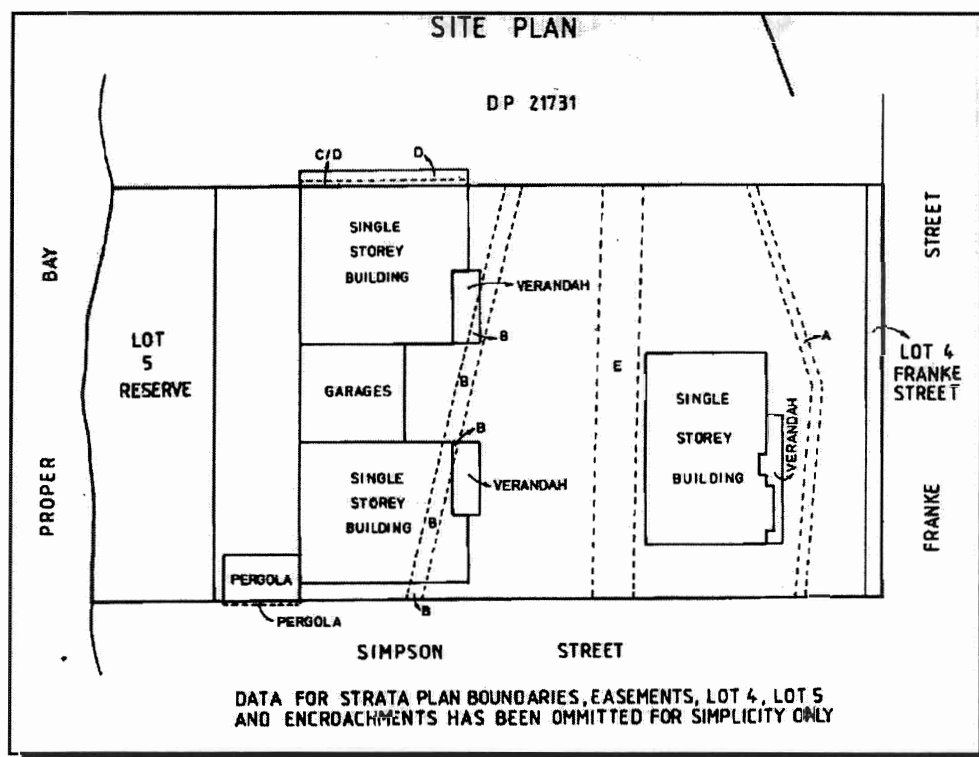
A TYPICAL SITE PLAN (EXCLUDING PANEL)
